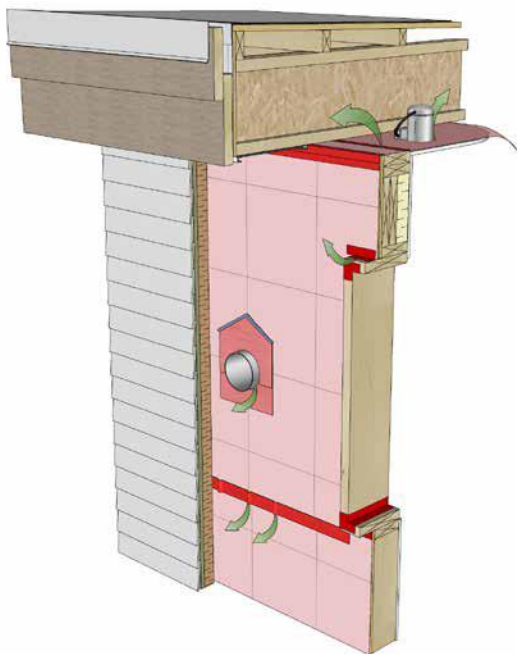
Common sheathing membrane and ceiling air barrier deficiencies.
